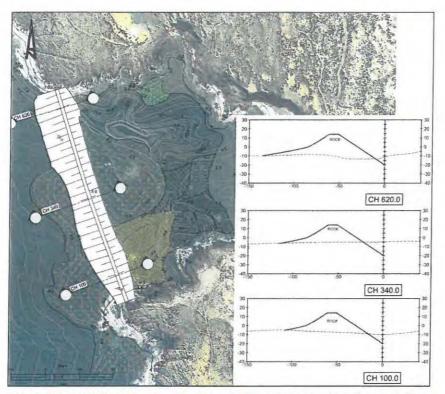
Layout and section for dynamically stable berm for closure of Rooiwal Bay
